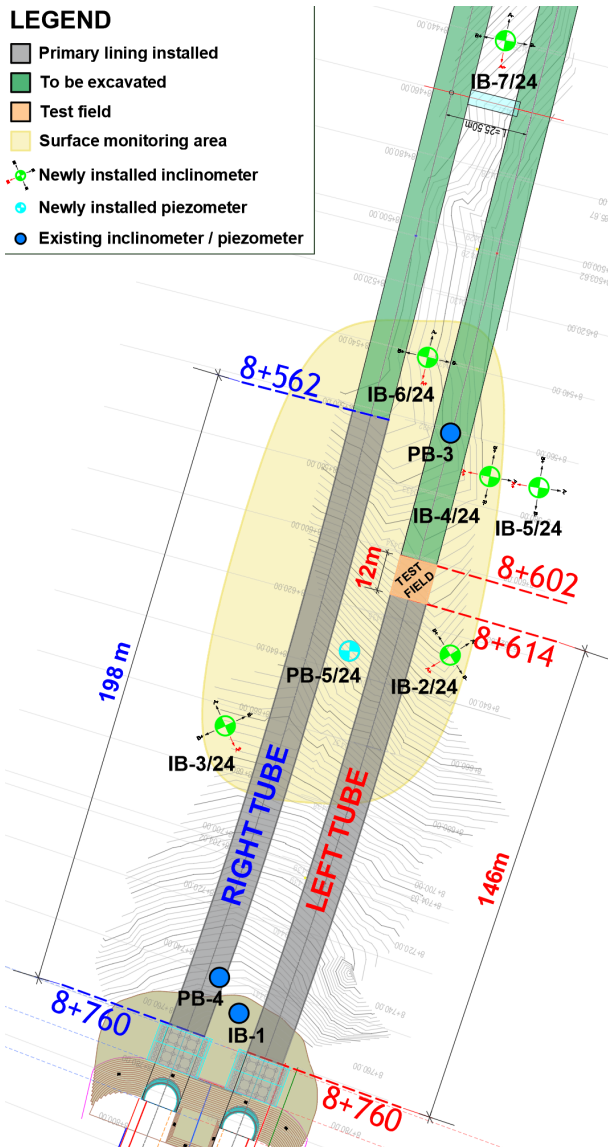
Location of additional boreholes for monitoring the state of the tunnel and possible landslide at southern portal of Putnikovo brdo 1 tunnel including the position of the test field.
